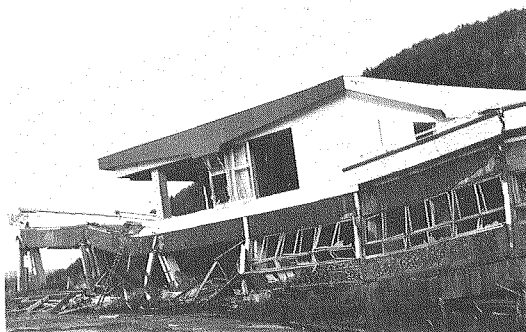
Broken building at Point B in Fig. 4 (a). It was originally three-storied. (photo. Sept. 1978)
